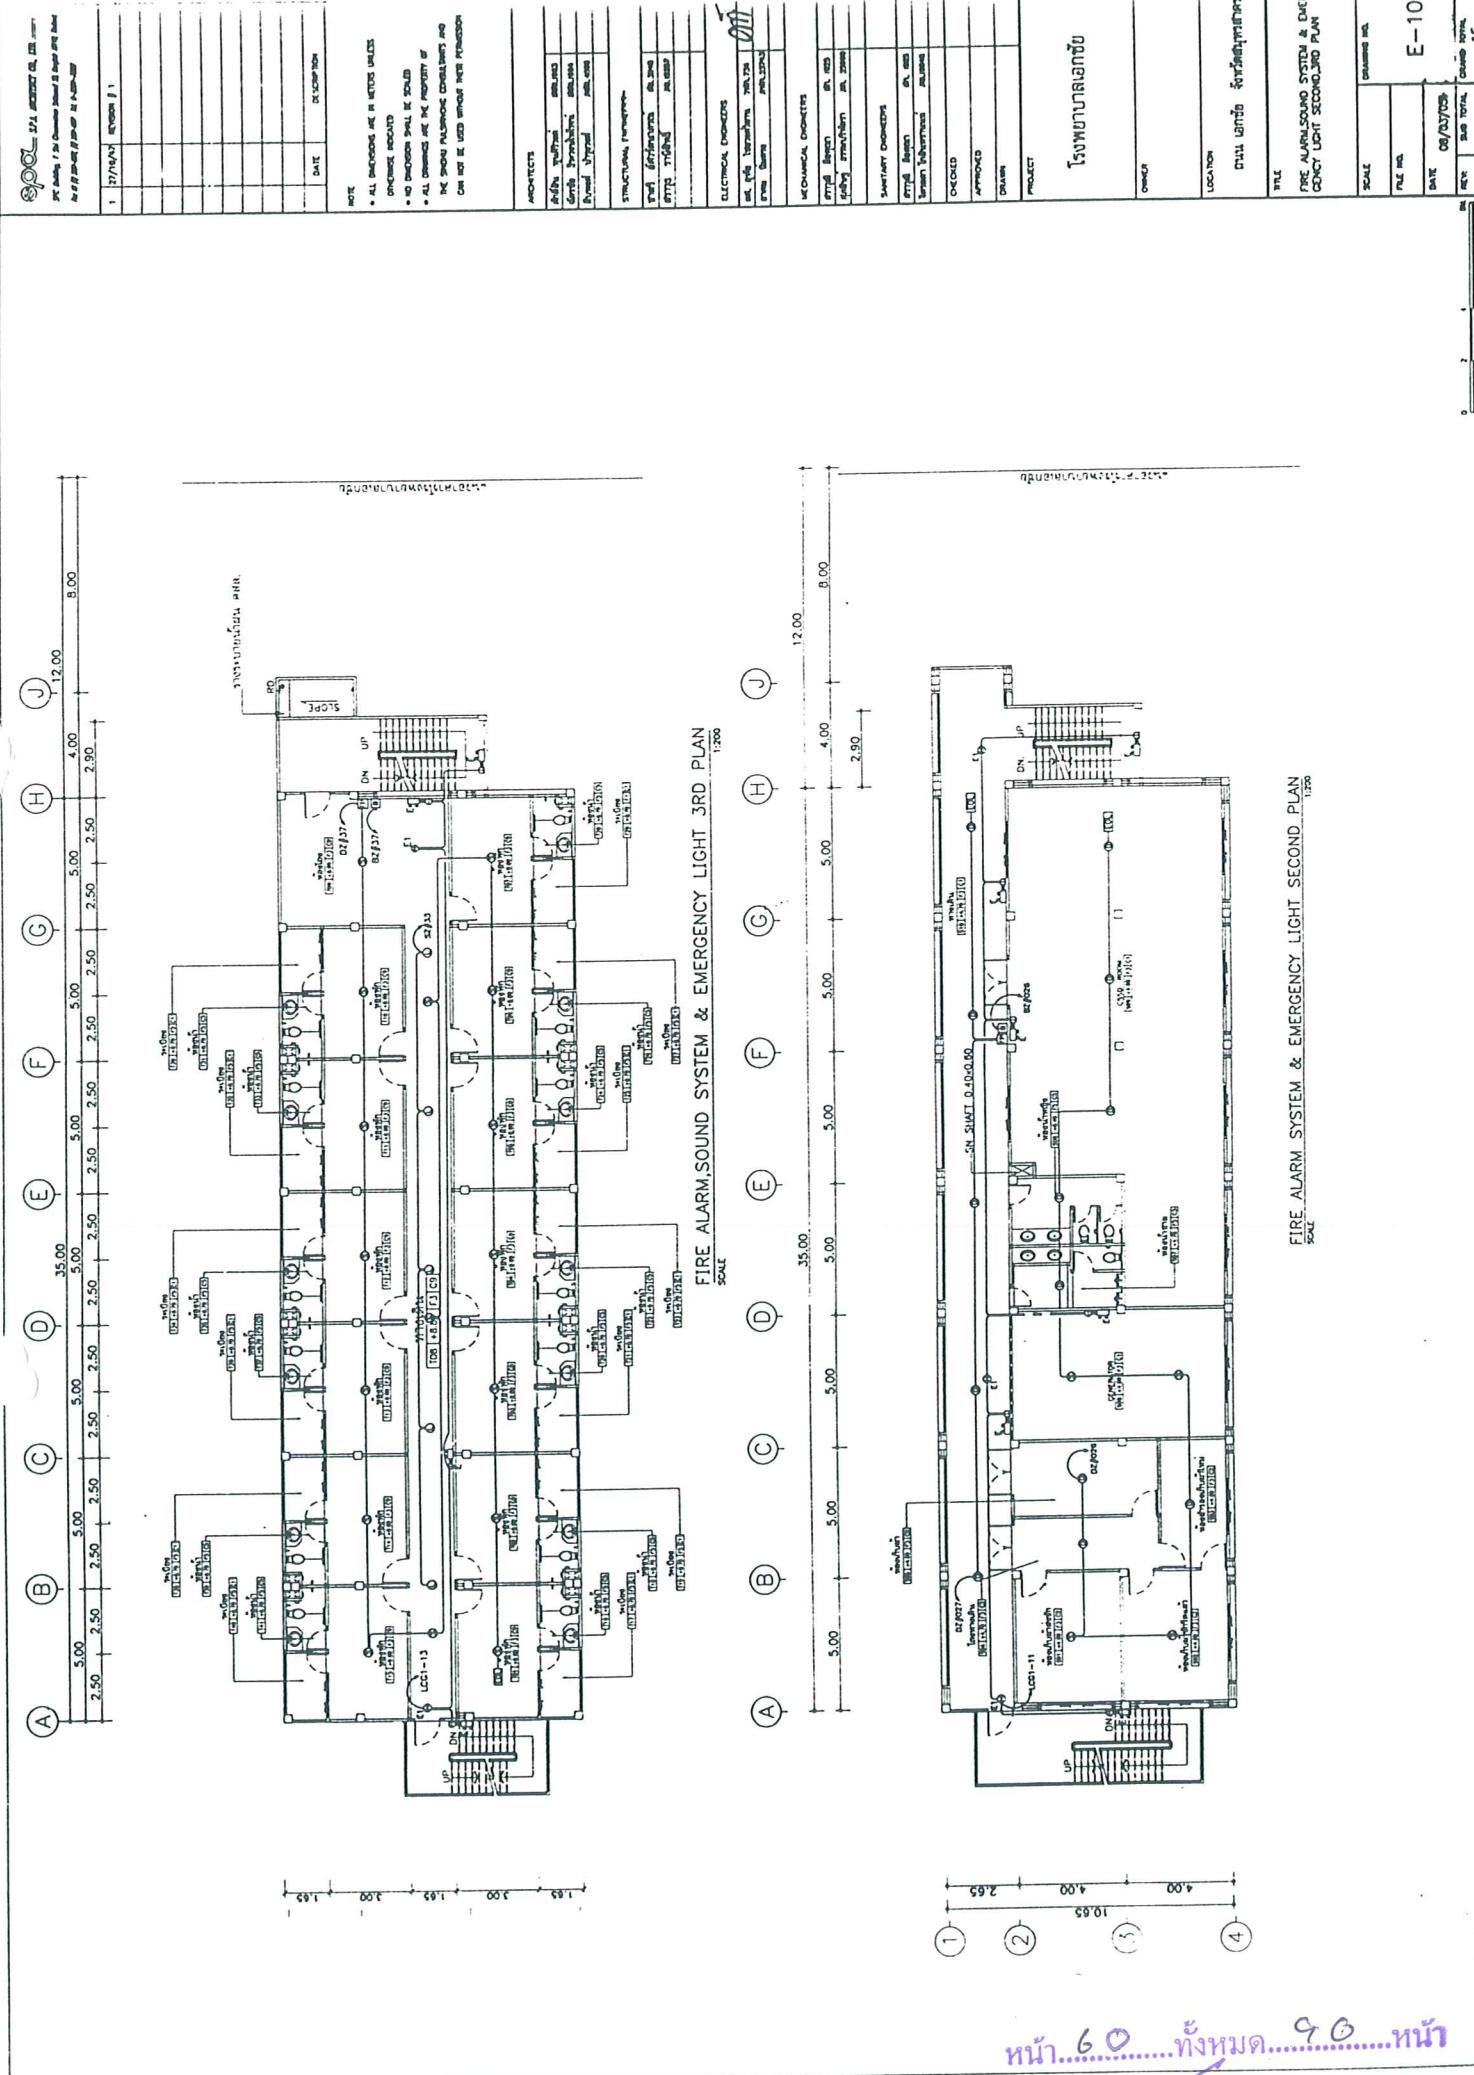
FIRE ALARM SYSTEM & EMERGENCY LIGHT 2ND PLAN
